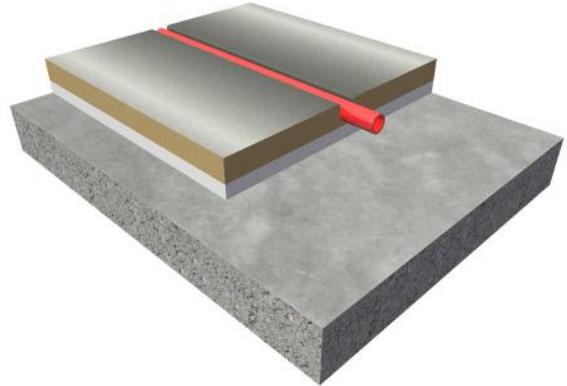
Thermalboard EPS™ installed over concrete subfloor
